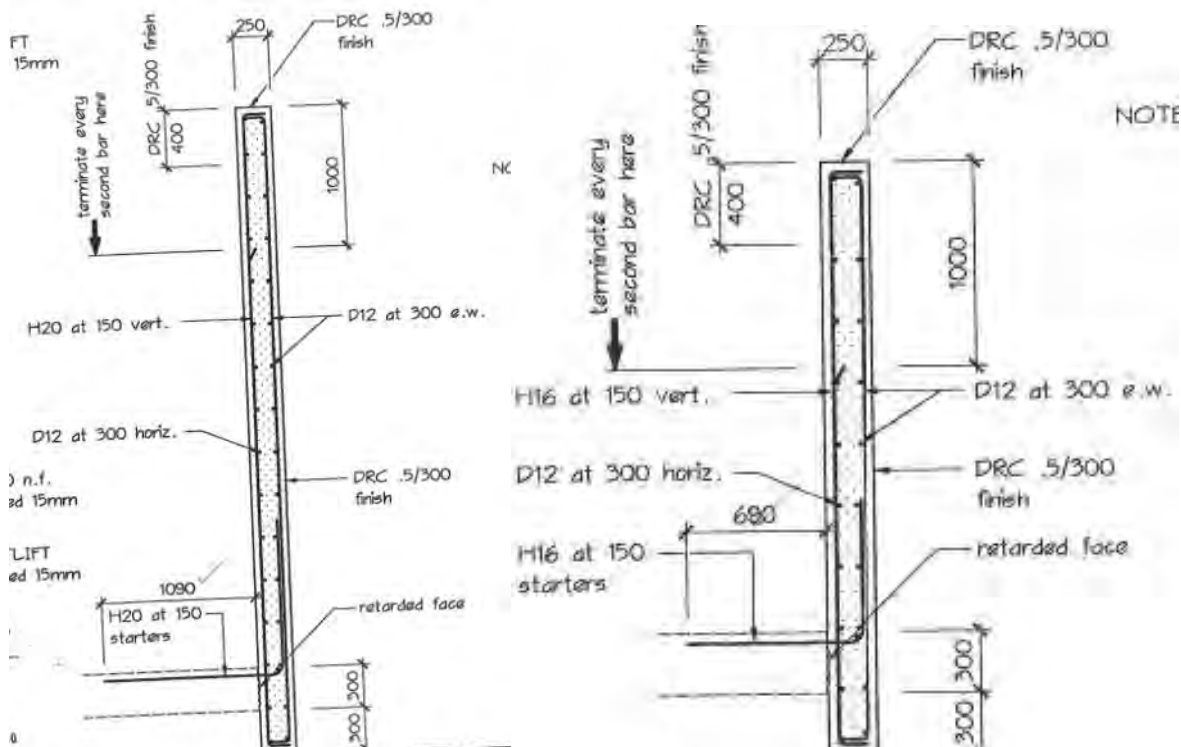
Extract from as-built drawing - showing the reinforcement detail of precast concrete wall panel and start bar connection to the footing
